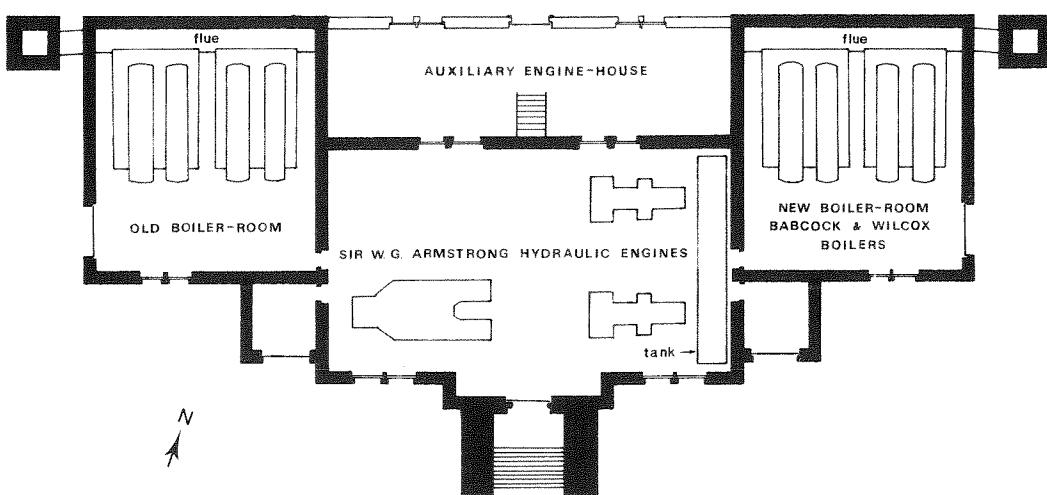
Plan of Bullock Island Hydraulic Power-House, 2nd Extension, 1891. Adapted from New South Wales Railways Archives Plan No. E 14/605.
